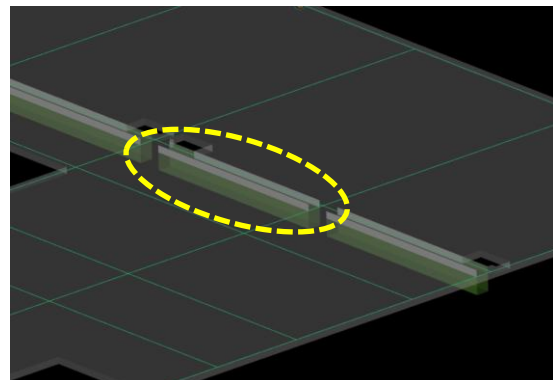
Beam Formwork Deducted by Slab in Cubicost
